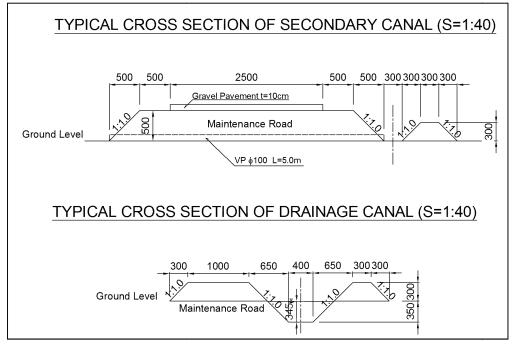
Typical Cross section of Secondary Canal & Drainage
